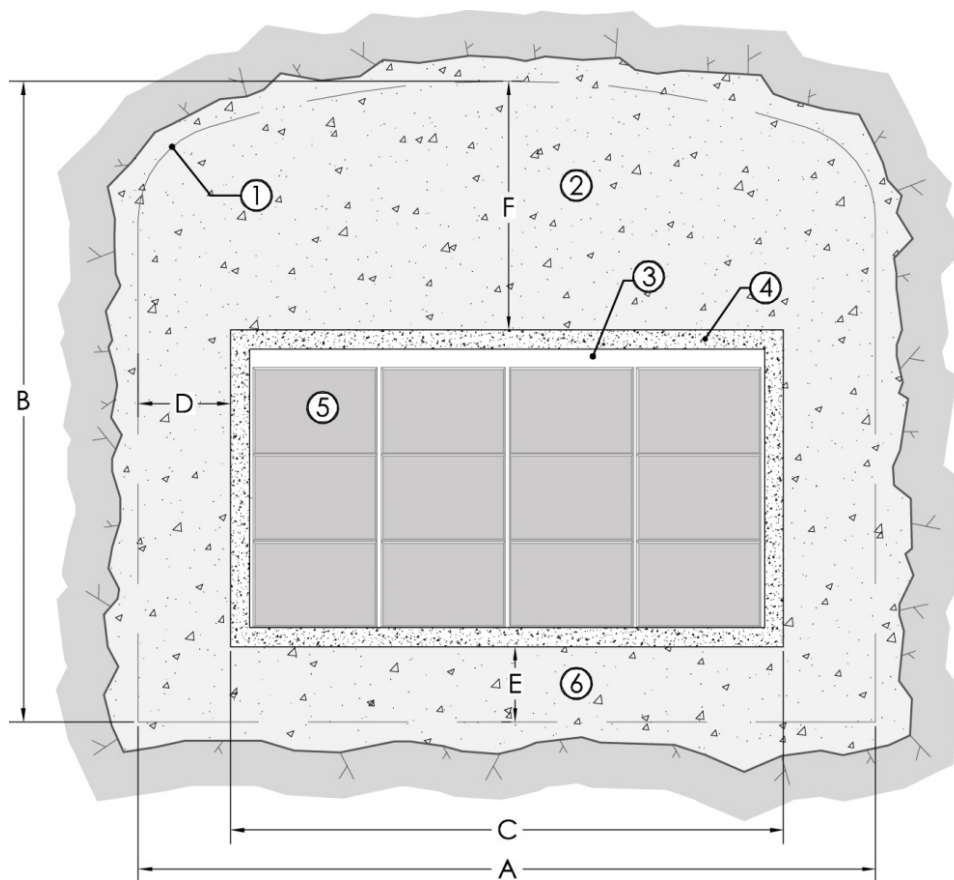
Schematic cross-sectional layout of the repository section for the waste from AB Svafo and Studsvik Nuclear AB. Legend: (1) Theoretical tunnel contour. (2) Bentonite pellets. (3) Grout. (4) Concrete structure for the operating phase (0.5 m). (5) Granite pillars. (6) Waste container. (7) Bentonite blocks. Approximate dimensions: A = 20 m, B = 17 m, C = 16 m, D = 2 m, E = 2 m, F = 3–4 m, G = 2–3 m.
